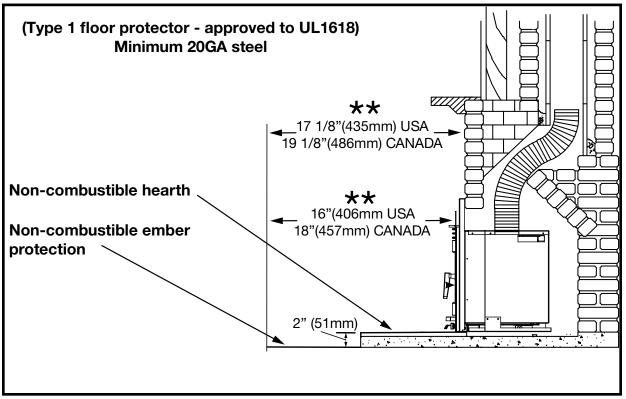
NEO 2.5 Insert LE Minimum ember protection dimensions.
